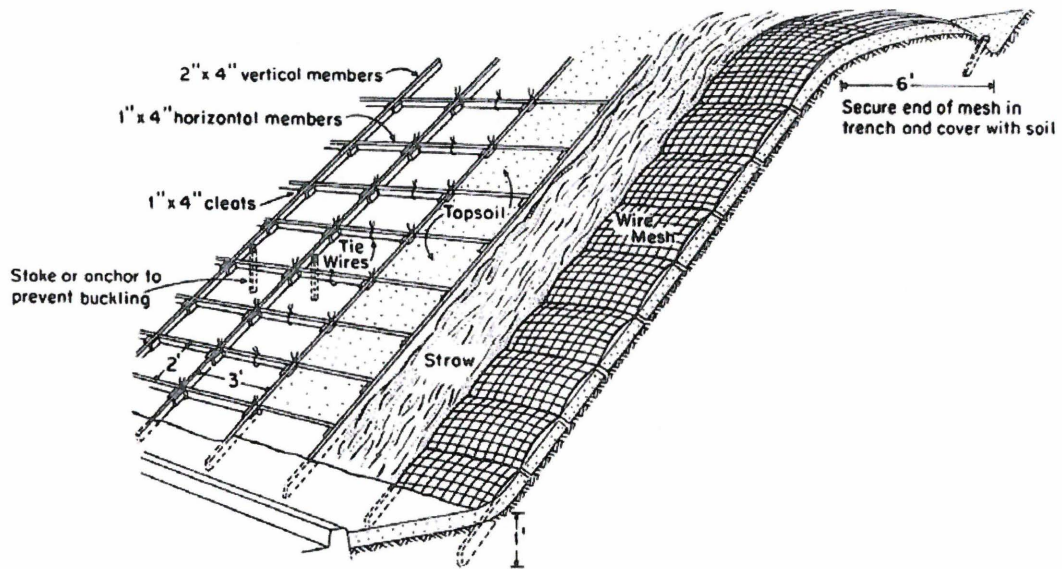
Anchored timber grid used to hold topsoil and slope plantings.
